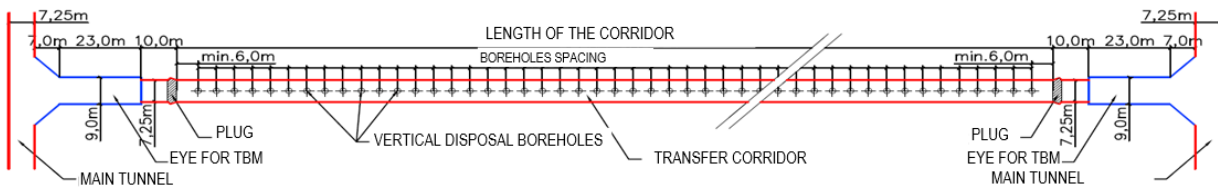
Schematic plan of vertical disposal, prevailing mechanised excavation (D1 - VD, M) (Grunwald et al. 2018). Red lines = TBM tunnels, blue lines = D&B tunnels.
